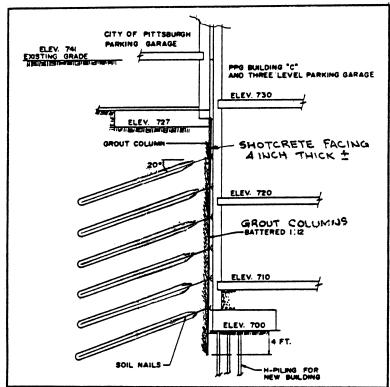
Cross section at PPG Building, Pittsburgh, PA, Parking Garage excavation, showing the nailed face pretreated by grout columns. (Nicholson and Wycliffe-Jones, 1984)
